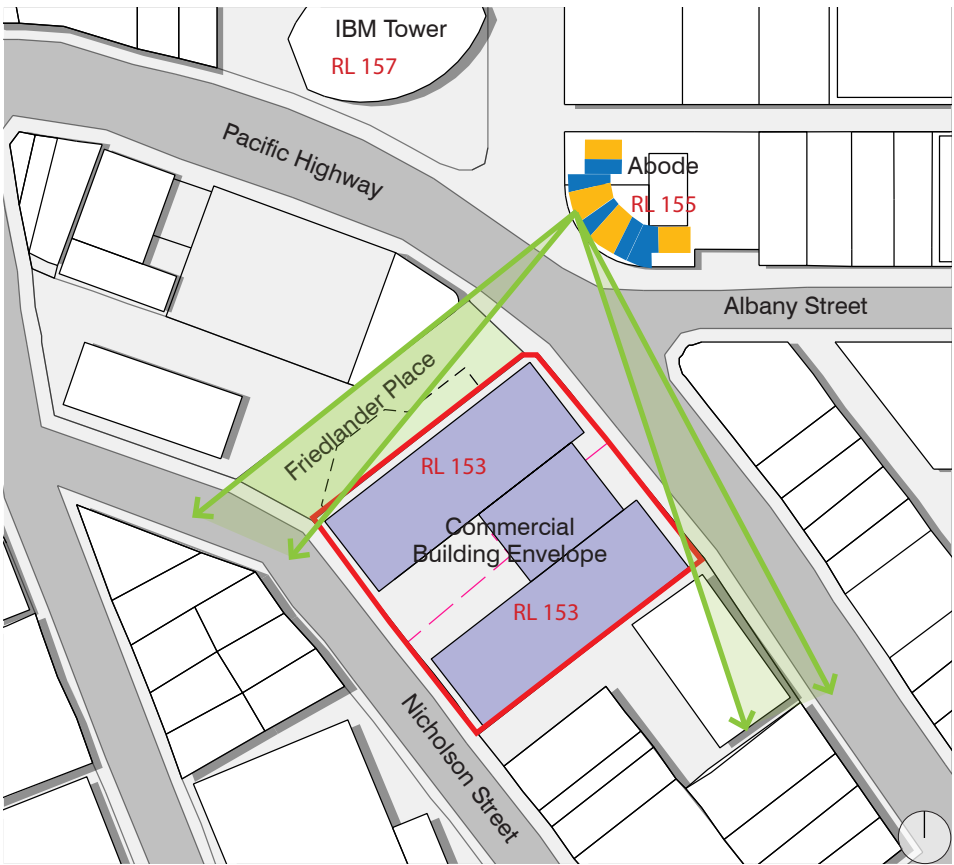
Indicative view corridors across subject site with Permissible 65m Commercial Building Envelope under the previous LEP and DCP
